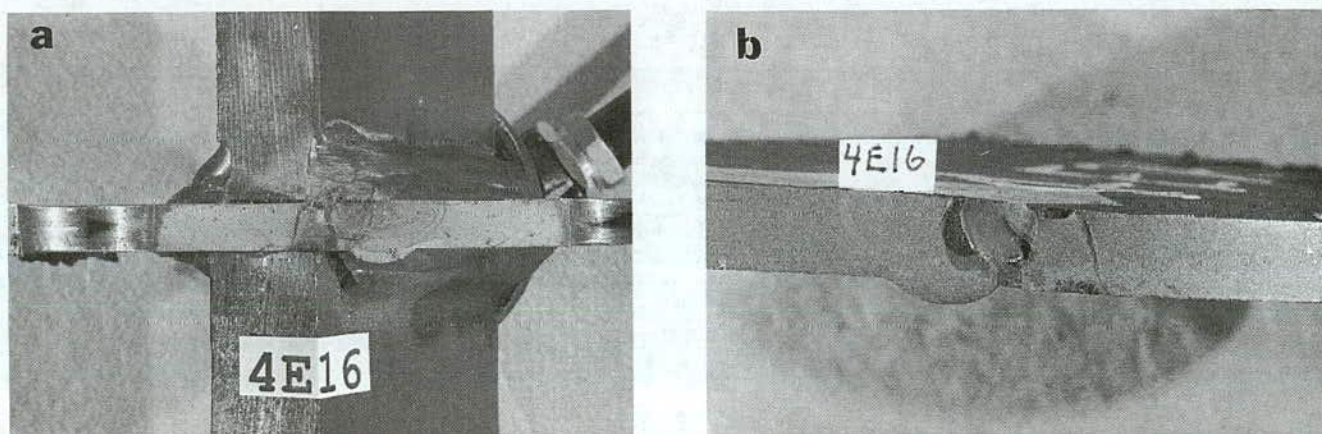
Crack surfaces of web detail 16 Beam 4E with large initial defect. (a) View of crack surface showing origin at weld toe. (b) Close-up view of initial defect in web plate.
